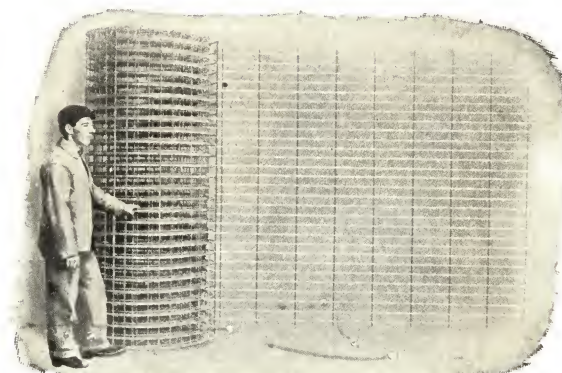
PHOTO OF ROLL OF CLINTON ELECTRICALLY WELDED WIRE FABRIC
